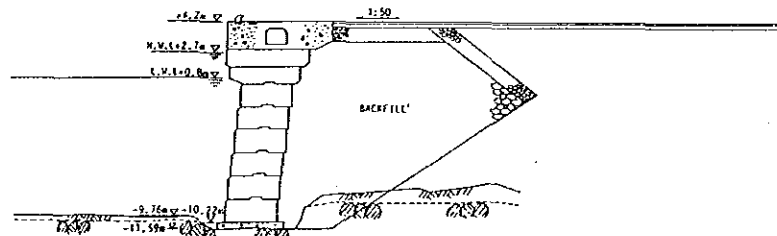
(3) Existing Quay Wall (Berth No.3-8, No.11)
